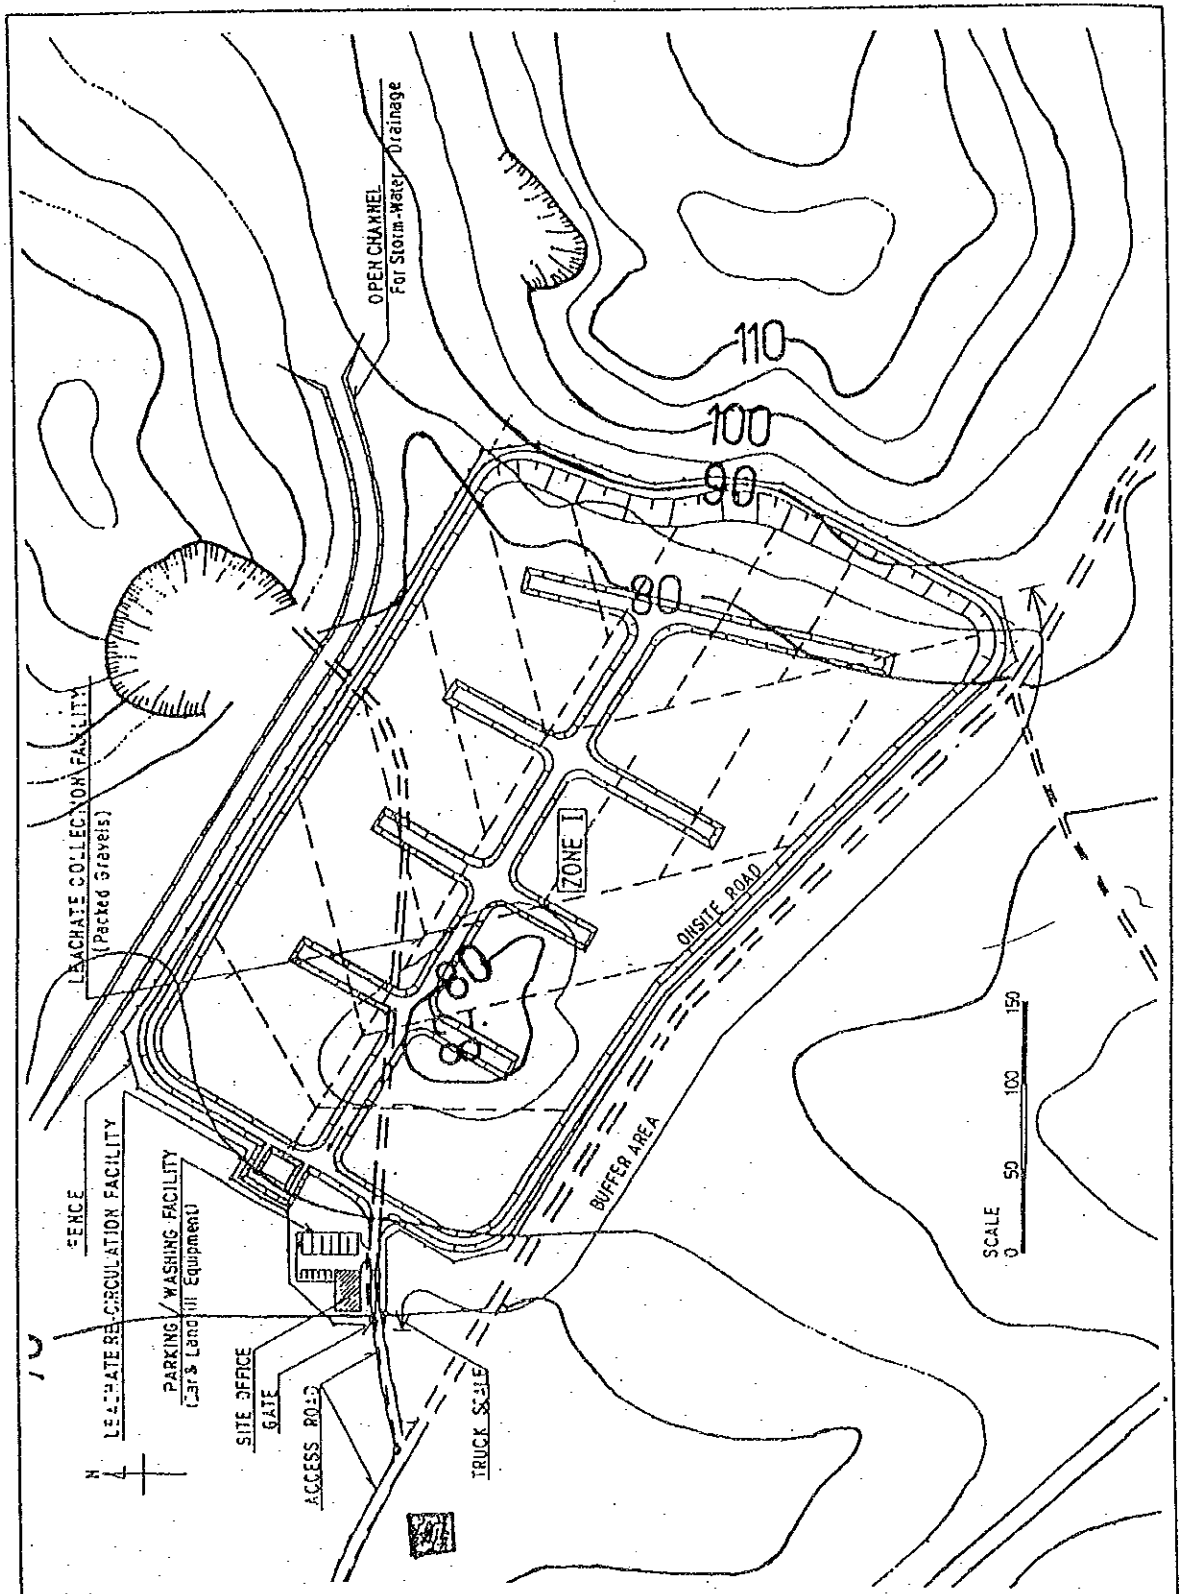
Facility Plan of Lahmidate Disposal Site (Zone I)
